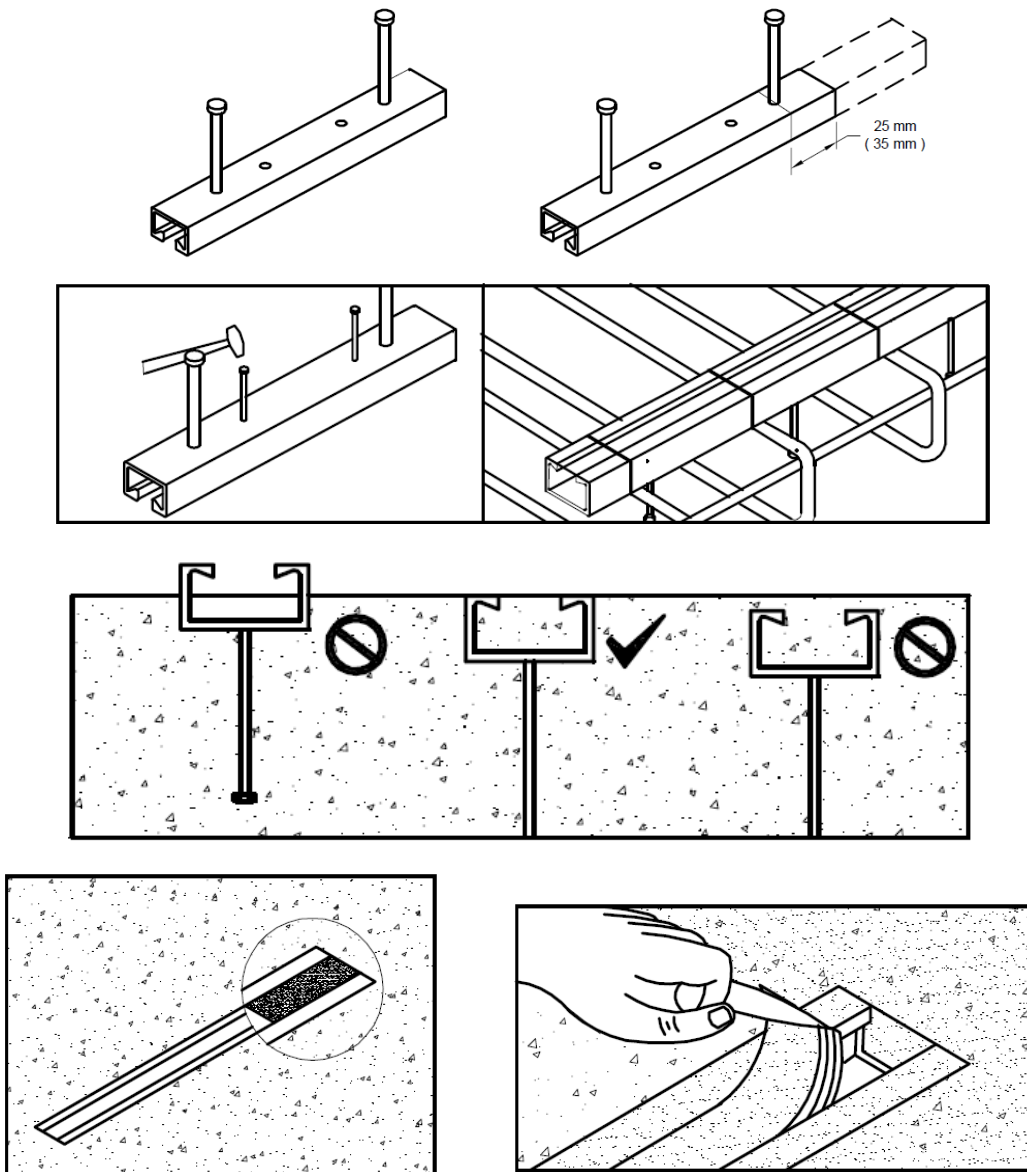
A INSTALLATION INSTRUCTIONS FOR CAST-IN ANCHOR CHANNELS
